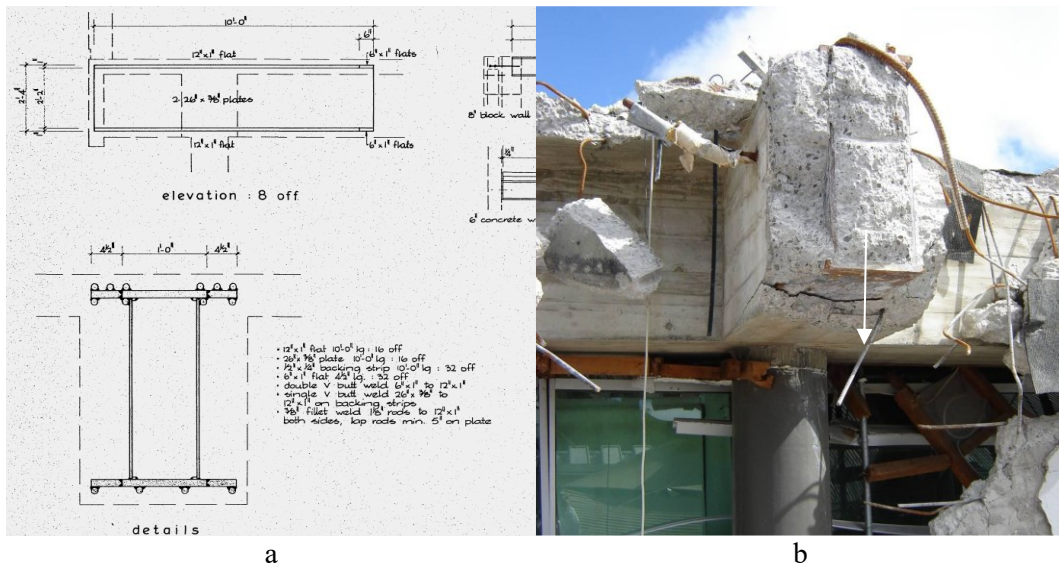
Enclosed steel beam in the original drawings (a) and as photographed after the collapse (b).
